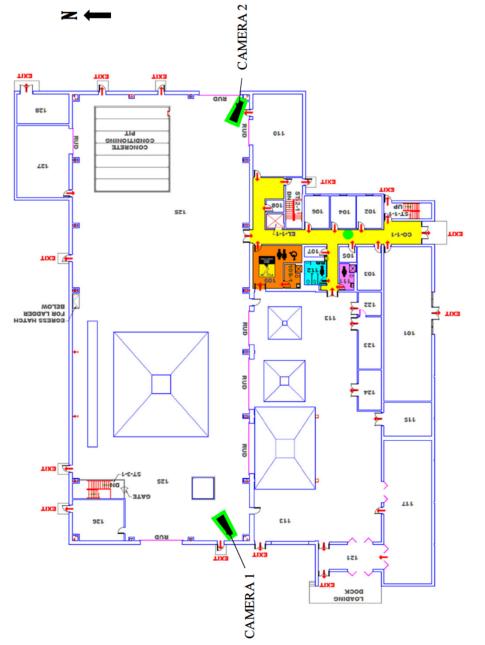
Scale plan view drawing of the NFRL showing the two camera locations inside of Room 125
